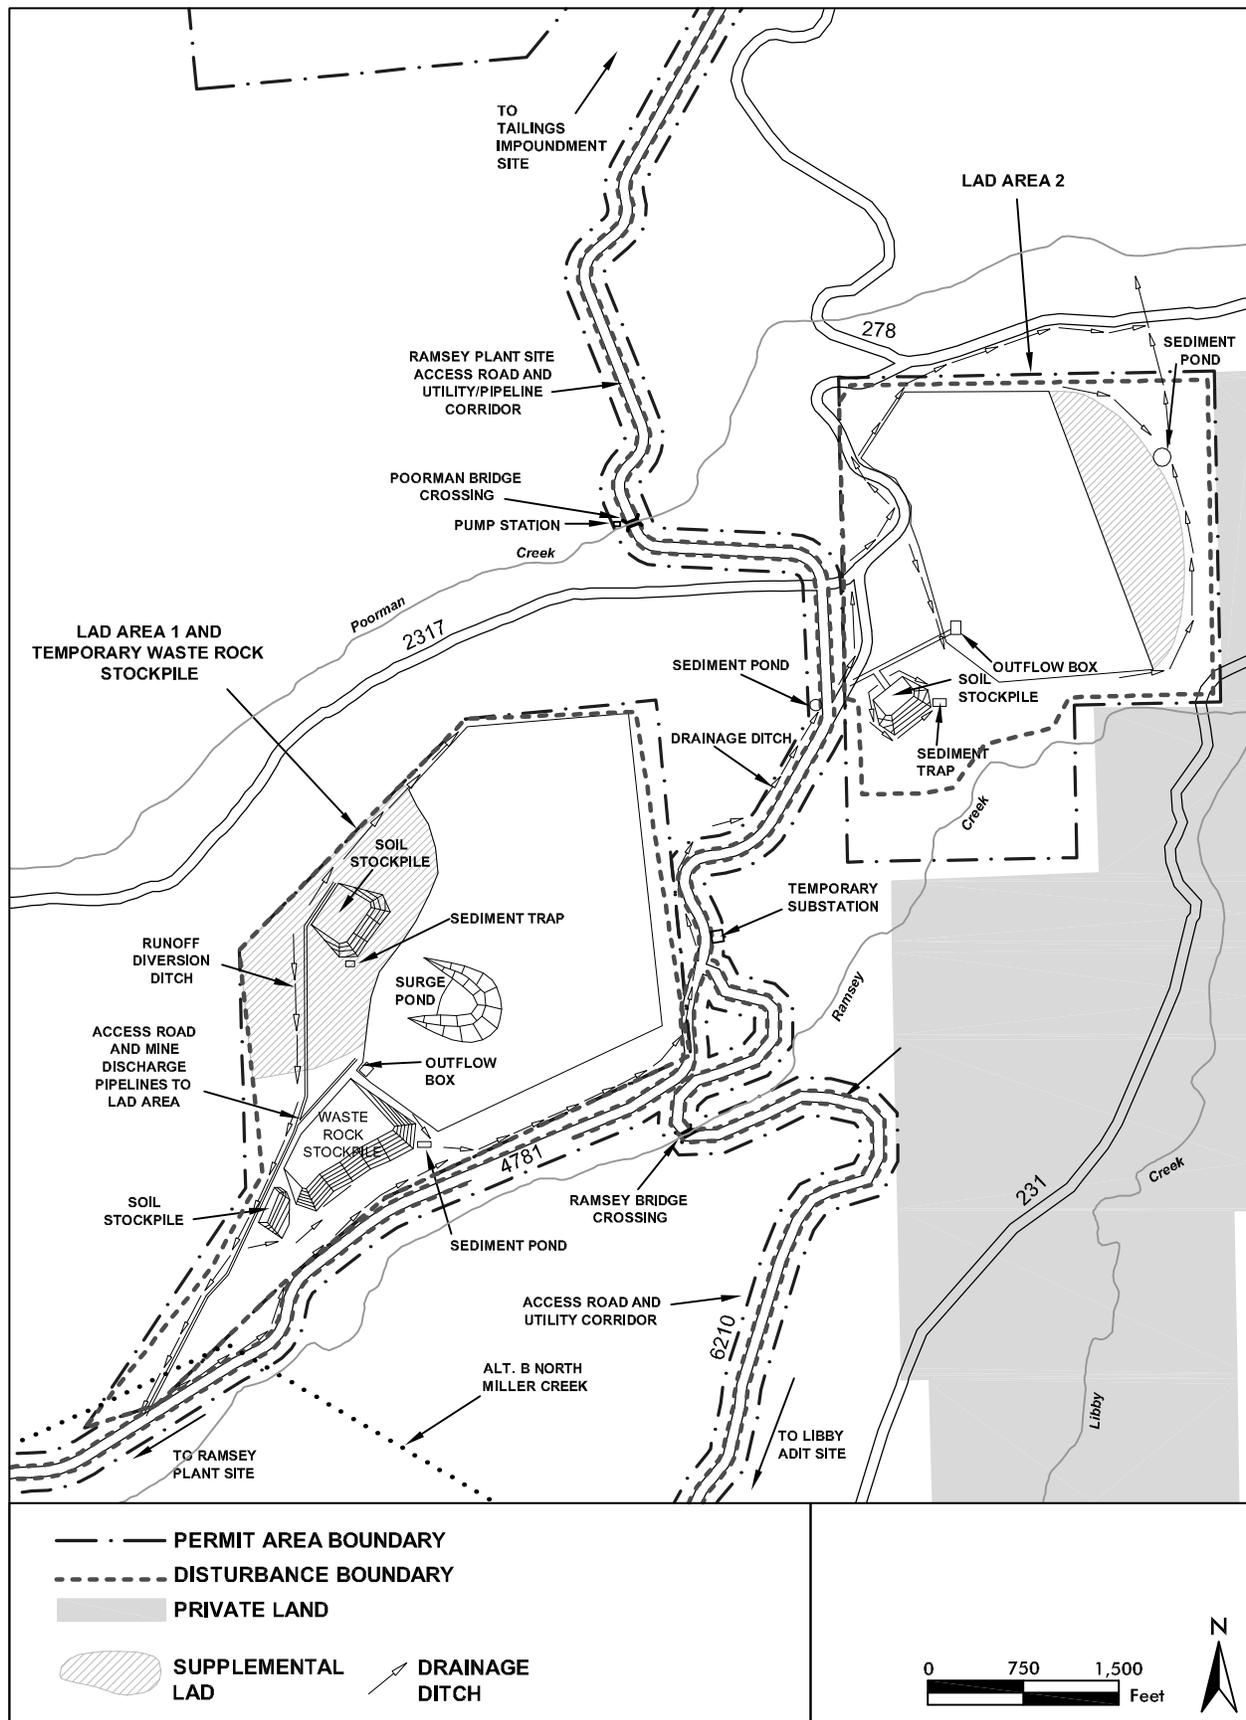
LAD Areas 1 and 2 and Waste Rock Stockpile, Alternative 2
